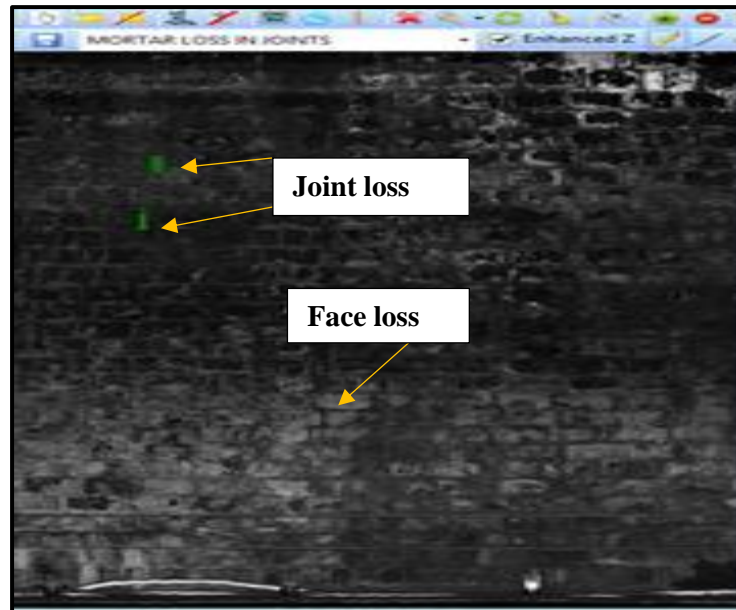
Laser Inspection Face and Joint loss- TL56
